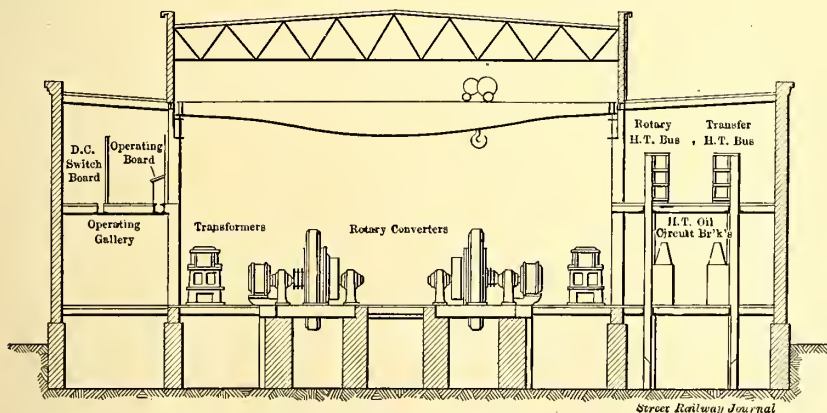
CROSS-SECTION OF TYPICAL SUB-STATION
